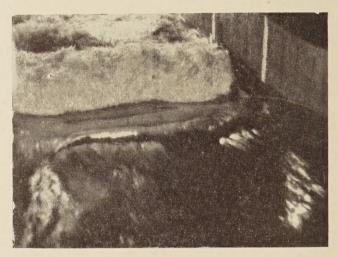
SINGLE-TRACK EMBANKMENT WITHOUT RAILS, 50.4 CUBIC FEET PER SECOND FLOWING OVER EMBANK-MENT, HEAD ON EMBANKMENT, 1.42 FEET
